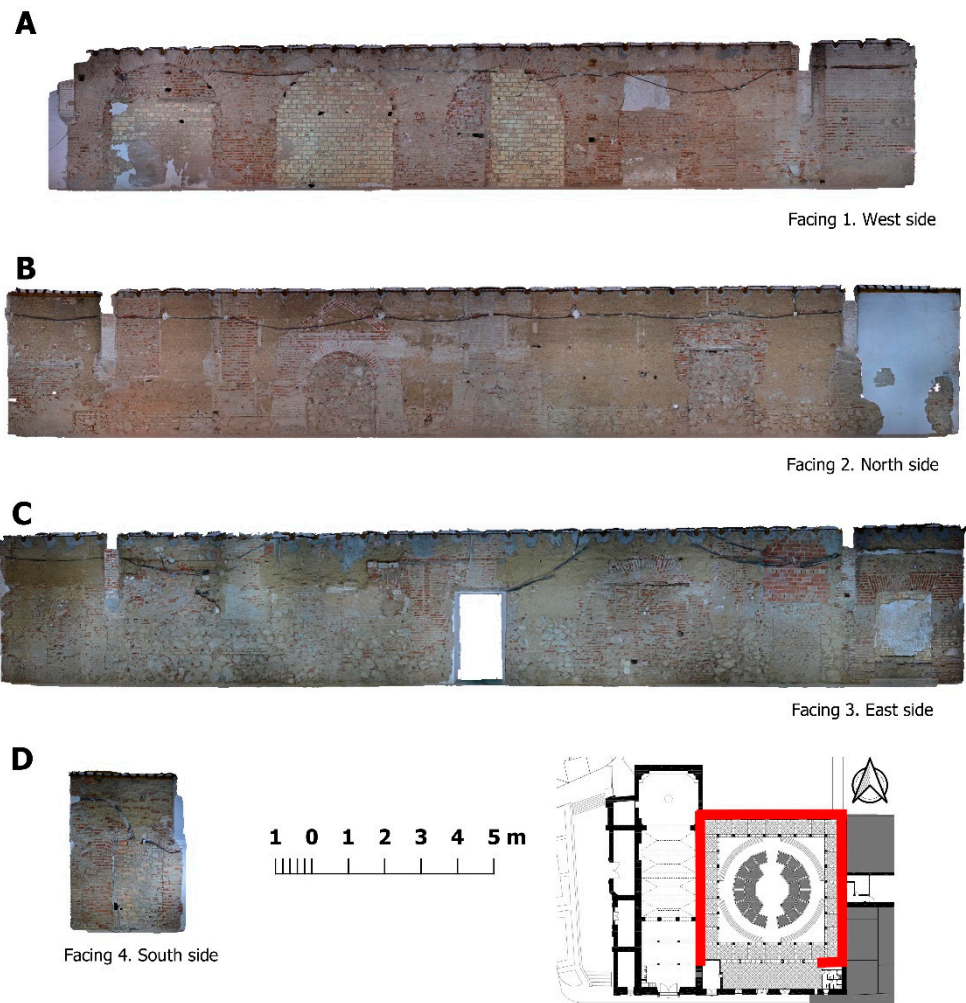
Facing's orthophotos: (A) west wall, (B) north wall, (C) east wall, (D) south wall.
